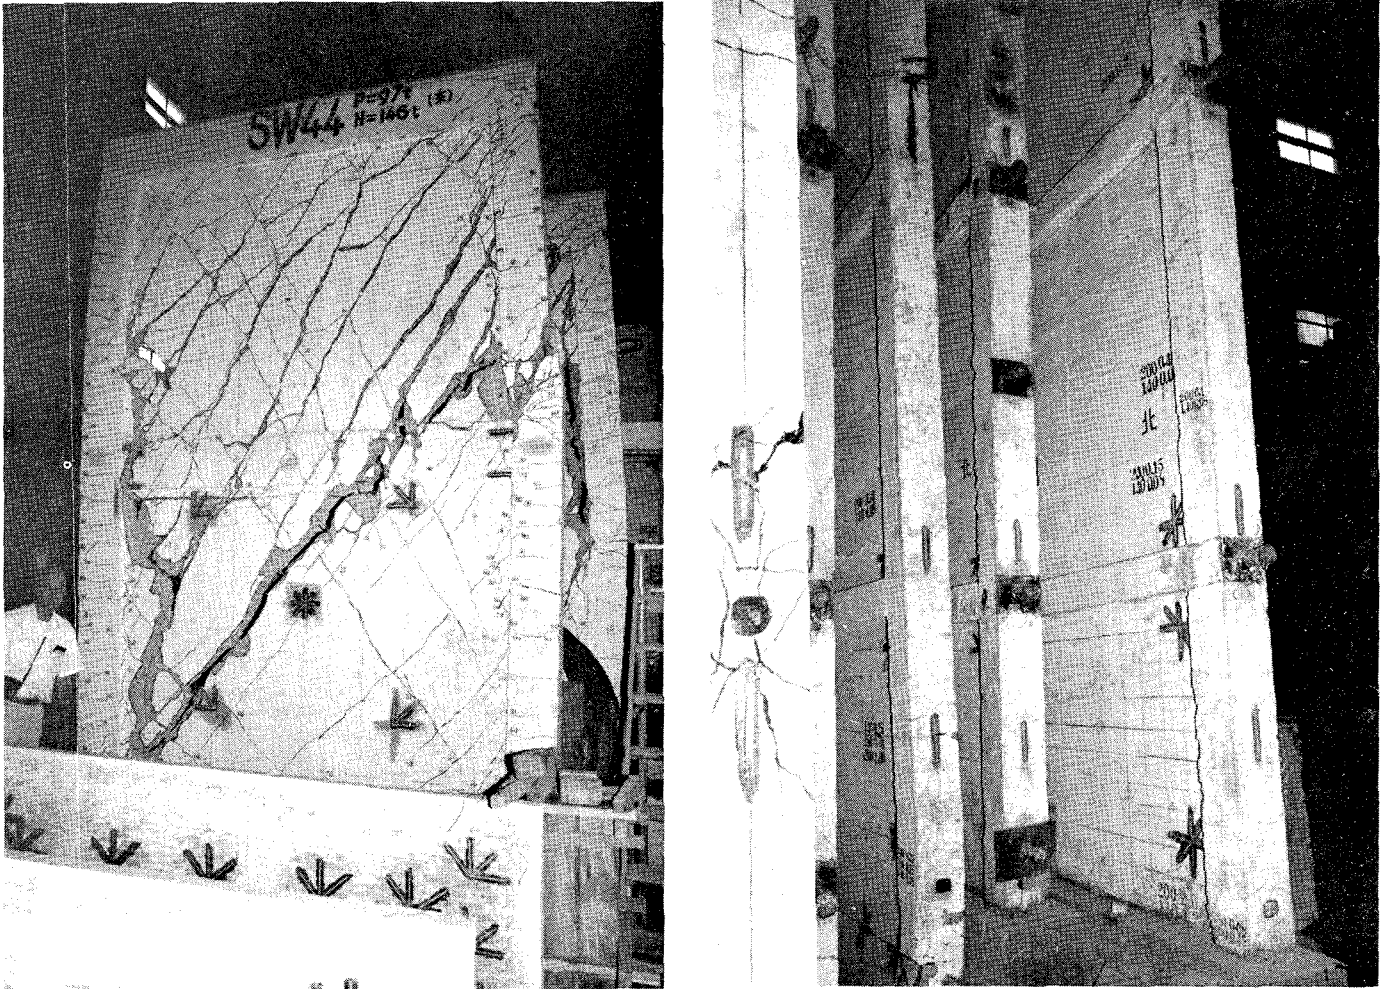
Shear wall specimens at the Academy of Building Research, Beijing.
